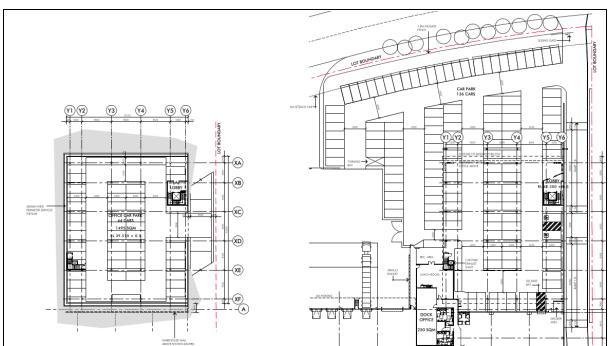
Extract of Basement Plan and Ground Level Car-parking
